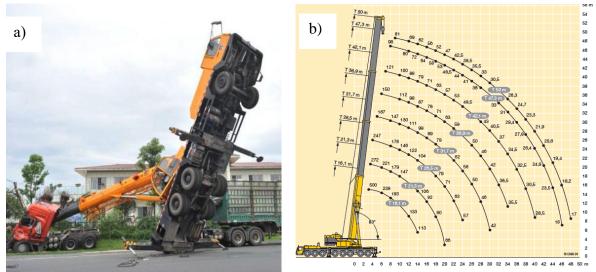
a) An example of a crane overturning due to overload, b) Truck-mounted crane load diagram
